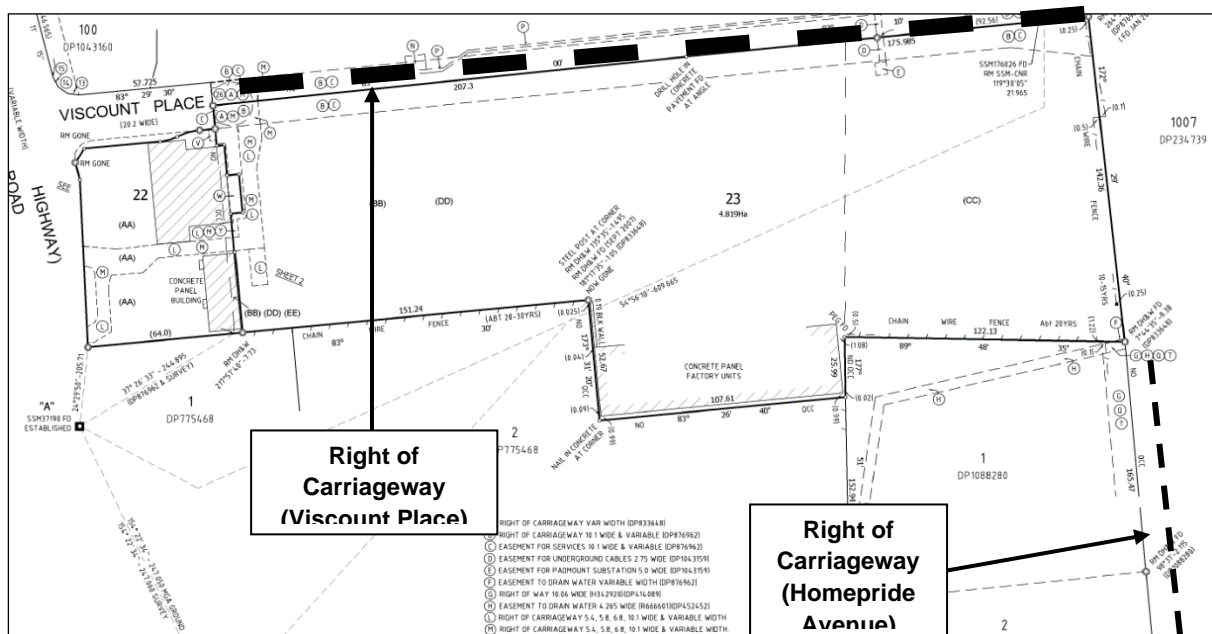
Extract from DP 1190437 identifying the registered easements for Right of Carriageway. The carriageways consist of existing private roads through the sites.
